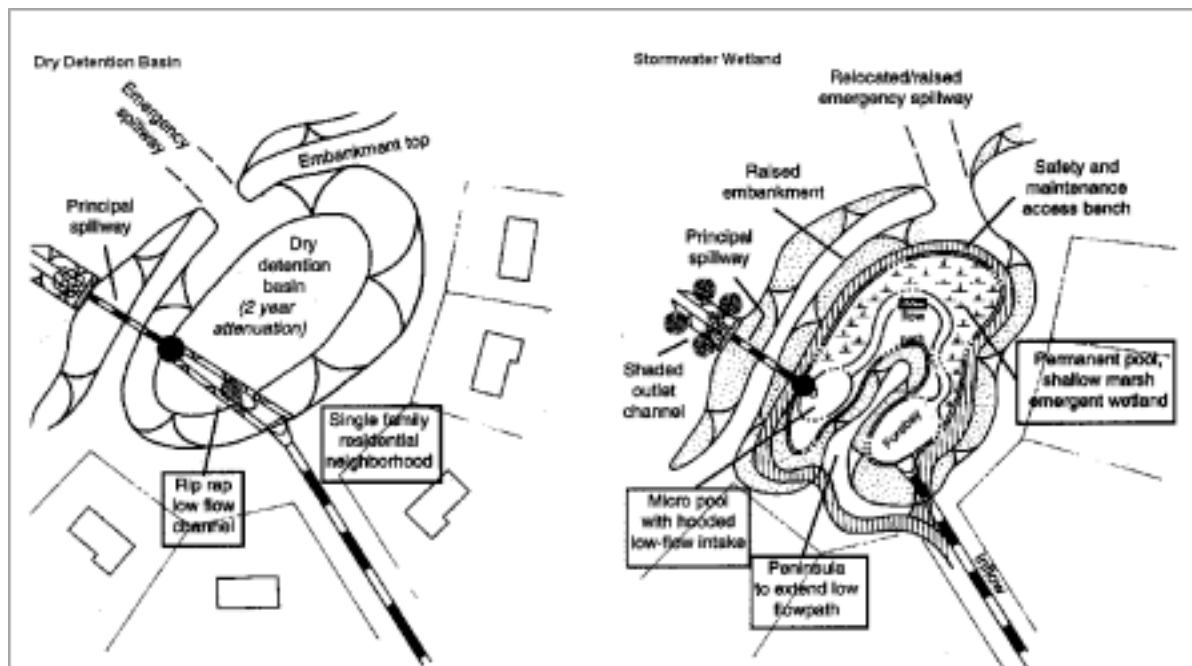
a Stormwater retrofit of an existing dry detention basin. Source: Adapted from Claytor, Center for Watershed Protection 2000
